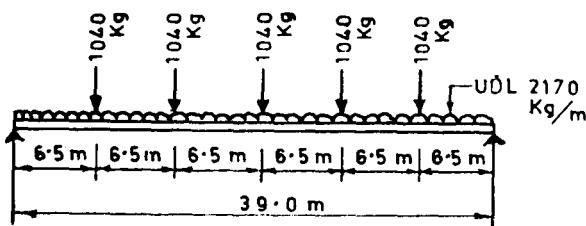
·14 DETAILS OF PSC GIRDER ( Example 16·1 )
